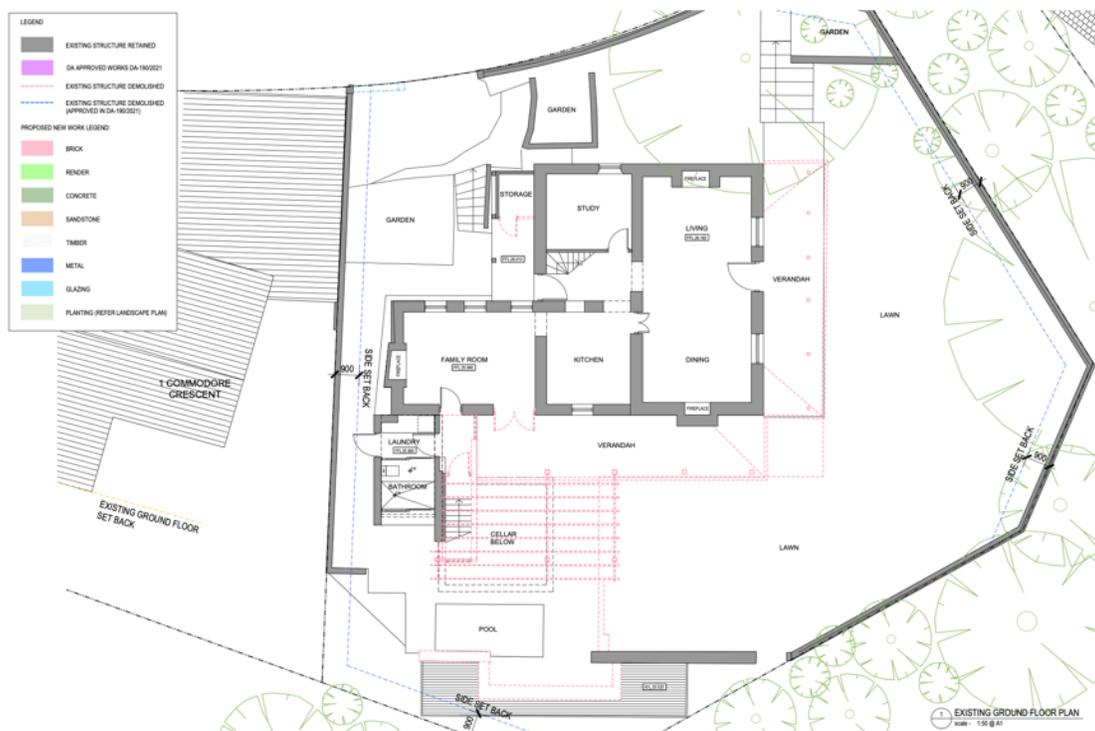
, Existing Ground Floor and Demolition Plan, Michael Cumming Architect, 24.02.23
